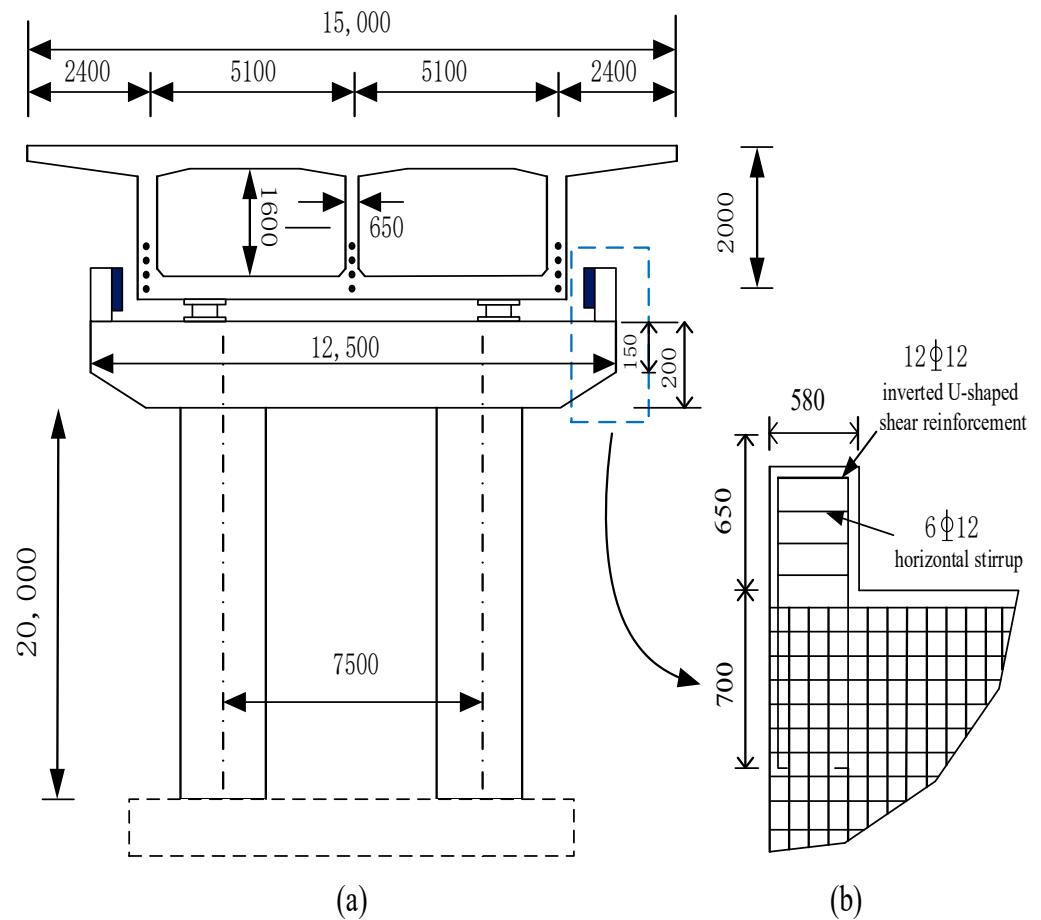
The bridge's structural dimensions: (a) cross-section; (b) stopper (unit: mm).
